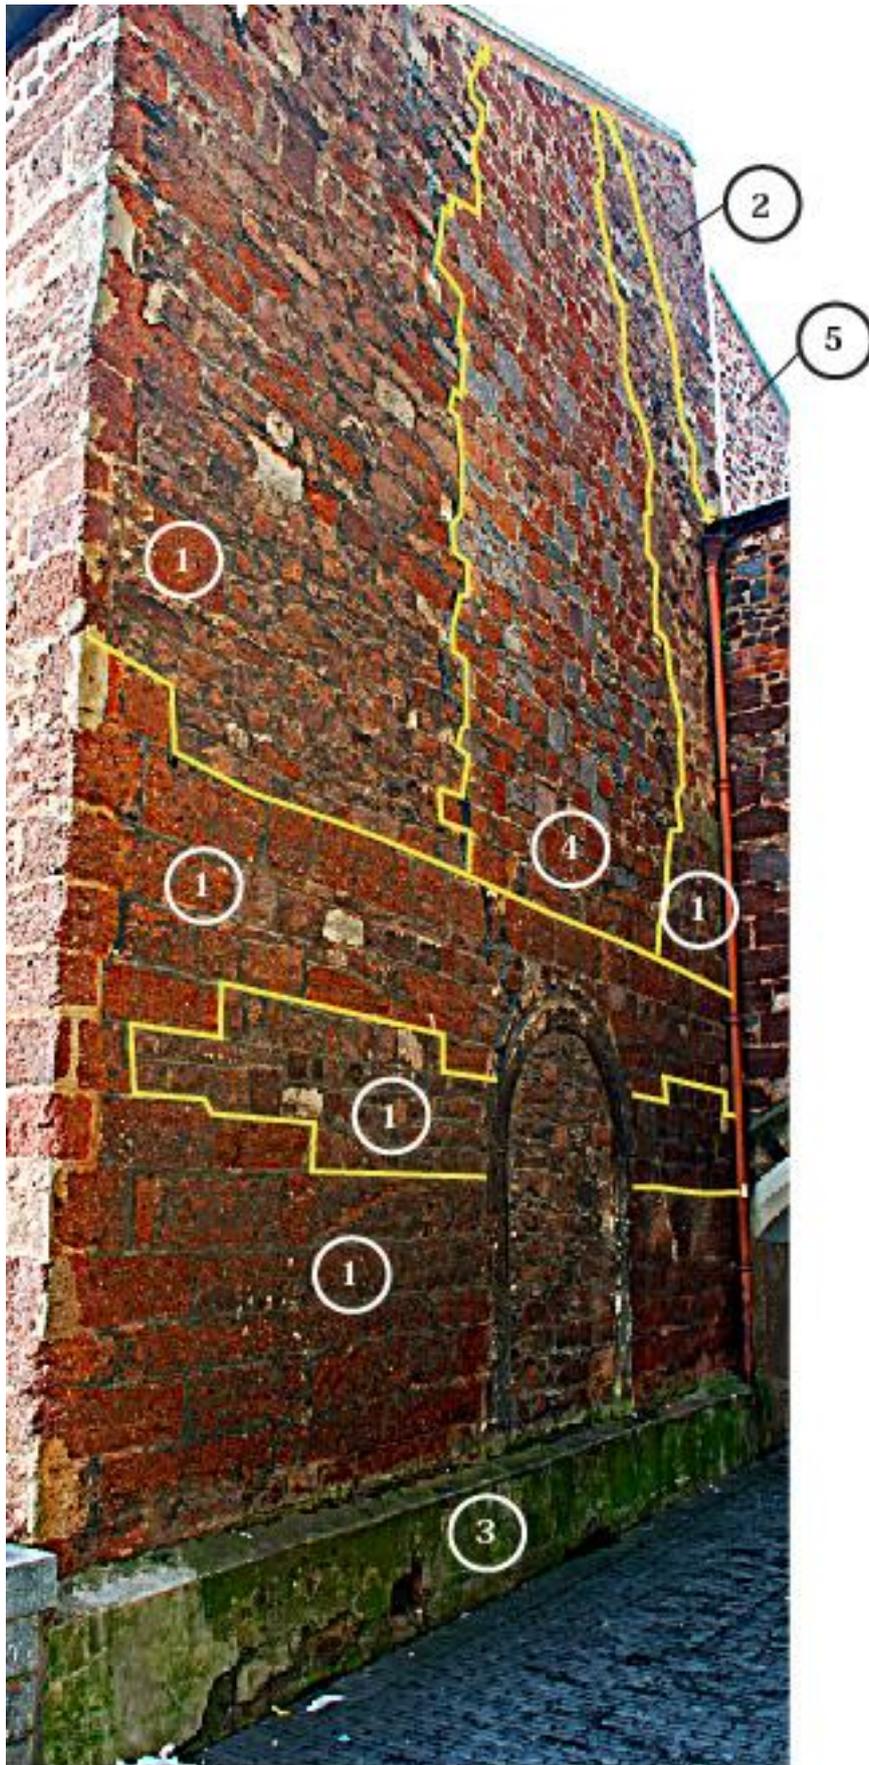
East elevation of south aisle, looking NW, showing phases of construction,
